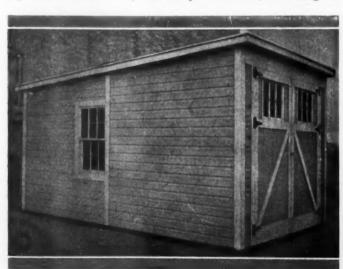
Pinyoun wood house with single slope roof. Ample light is afforded by glazed doors and side windows
